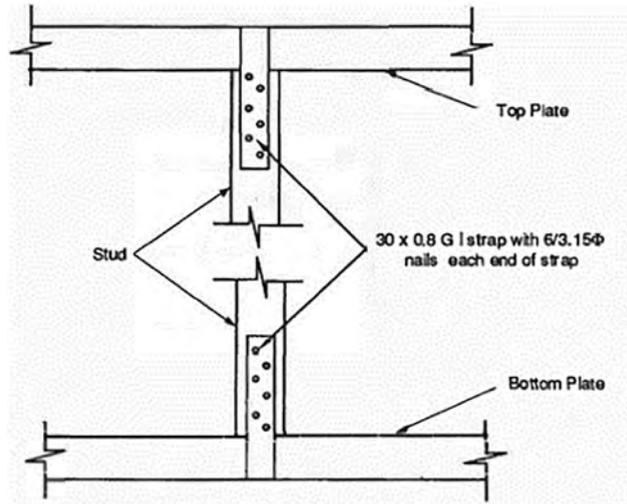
FIXING OF STUD TO TOP AND BOTTOM PLATE
